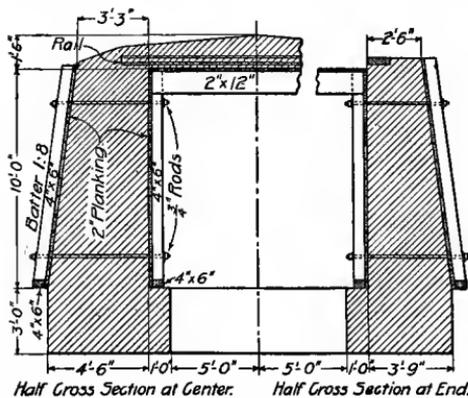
C. M. & ST. P. RAIL-TOP CULVERT.
